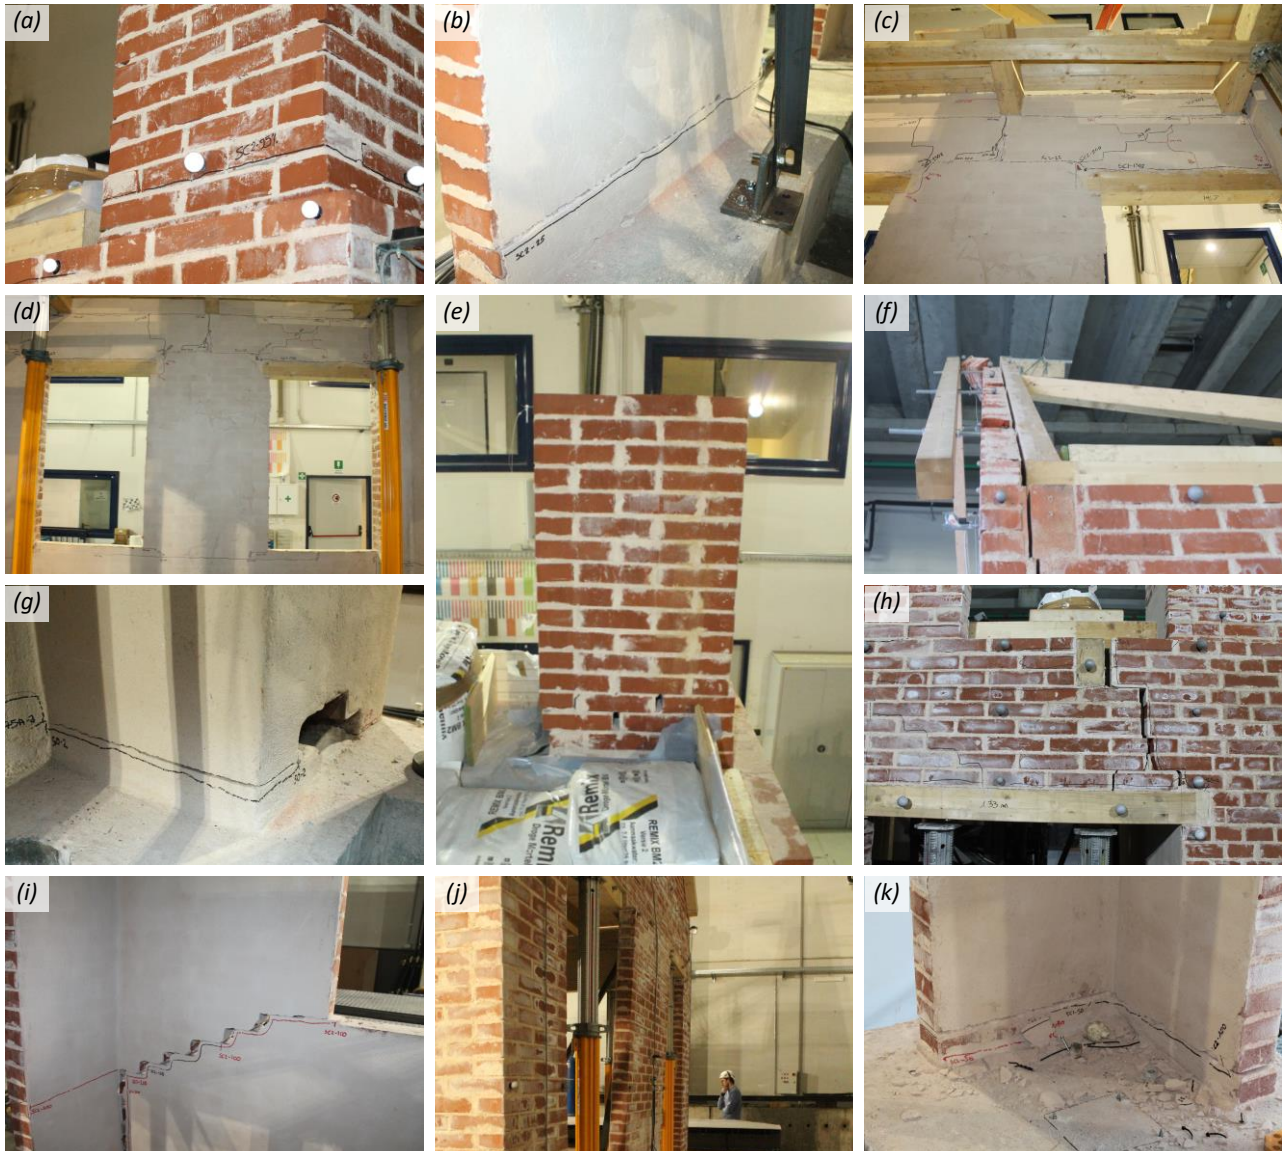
Observed damage mechanisms: (a) flexural cracking of the slender chimney in EUC-BUILD-8.1; (b) flexural cracking due to out-of-plane bending at the North central pier of EUC-BUILD-8.1; (c) damage to the spandrels at the West façade of EUC-BUILD-8.1; (d) flexural cracks due to in-plane rocking mechanism at the East piers in EUC-BUILD-8.1; (e) shear failure of the squat chimney in EUC-BUILD-8.1; (f) collapse of the top part of the gable in EUC-BUILD-8.2; (g) flexural crack at the bottom of the slender chimney in EUC-BUILD-8.2; (h) vertical cracks due to detachment of the slender chimney at the West façade of EUC-BUILD-8.2; (i) damage due to in-plane rocking mechanism at the East piers of EUC-BUILD-8.2; (j) out-of-plane mechanism at the North building façade in EUC-BUILD-8.2; (k) damage due to rocking behavior of the West piers in EUC-BUILD-8.3.
